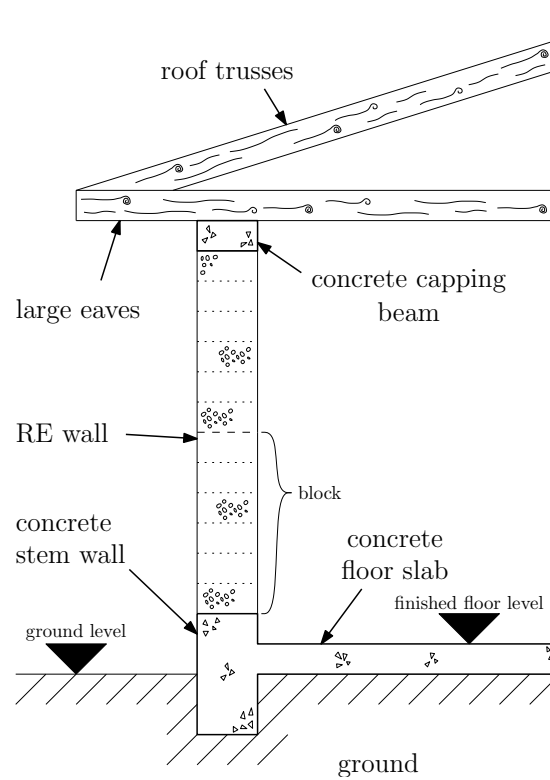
Simple detailing sketch of the use of a stem wall and overhanging eaves for RE wall protection. Note that additional details, for example roof and foundation detailing, are not shown.
